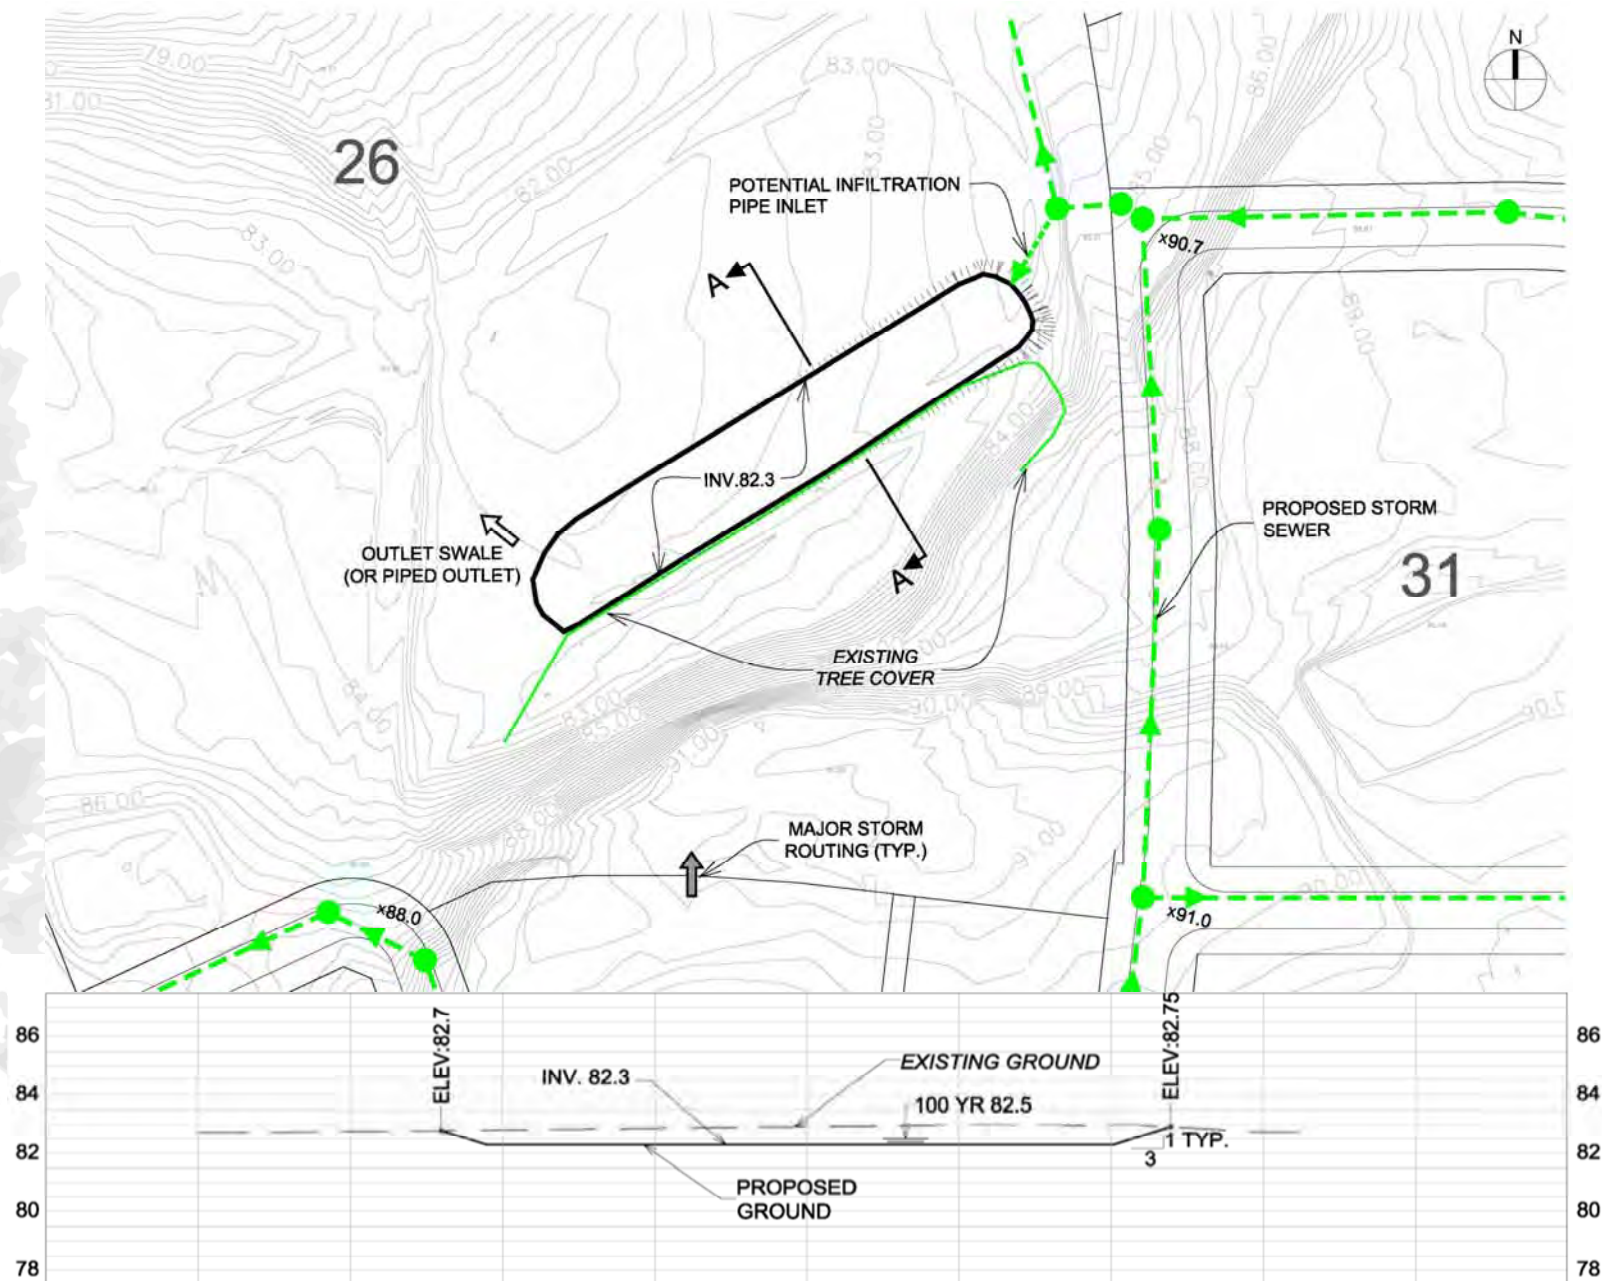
Eastern Dry Pond - Plan View and Cross Section A-A
